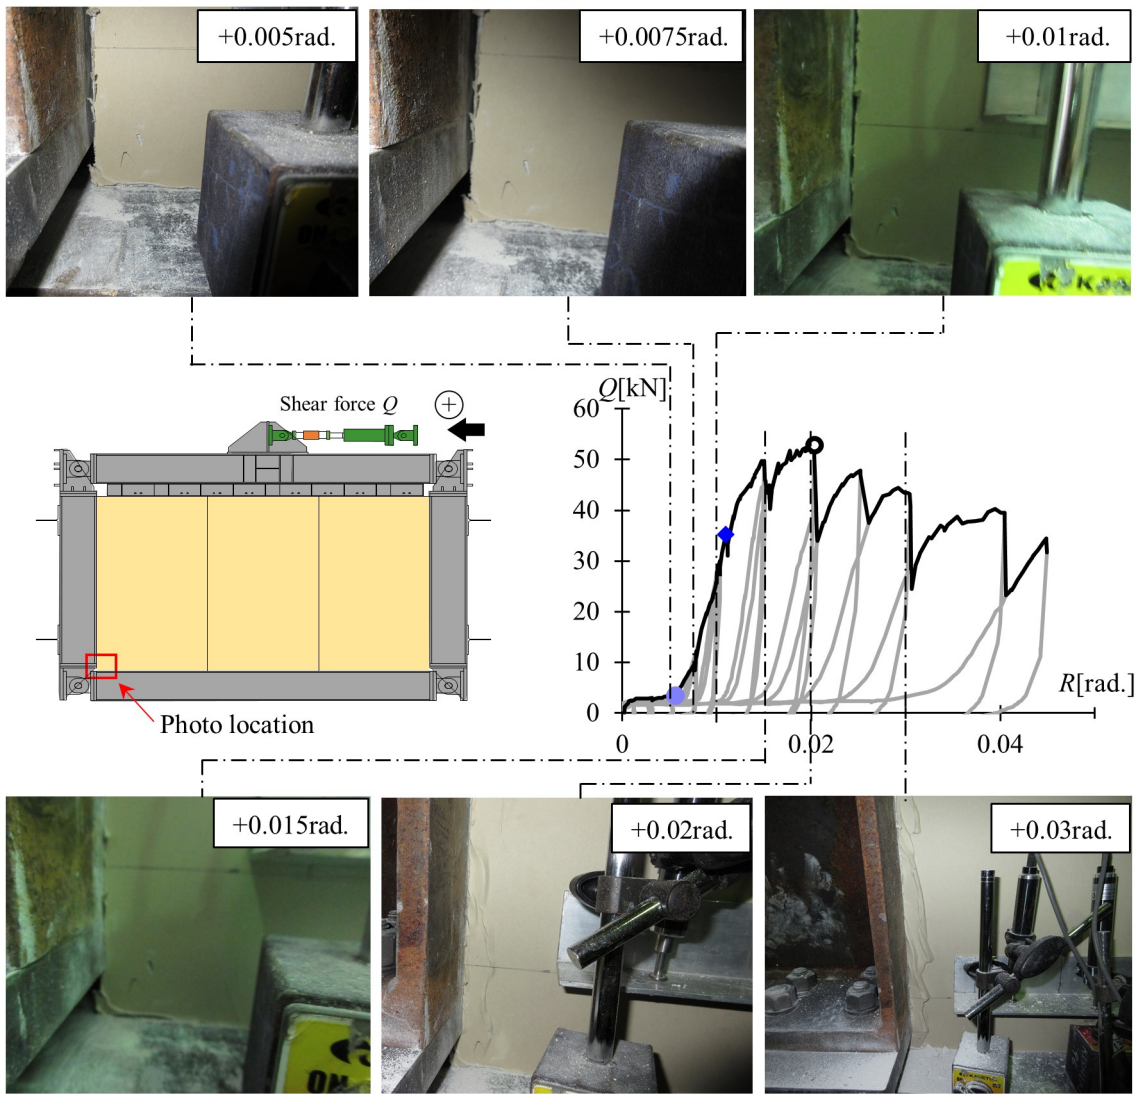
Damage to the gypsum board at loading cycle from 0.005 rad to 0.03 rad (Specimen S12.5\*4, lower left corner, reverse).
